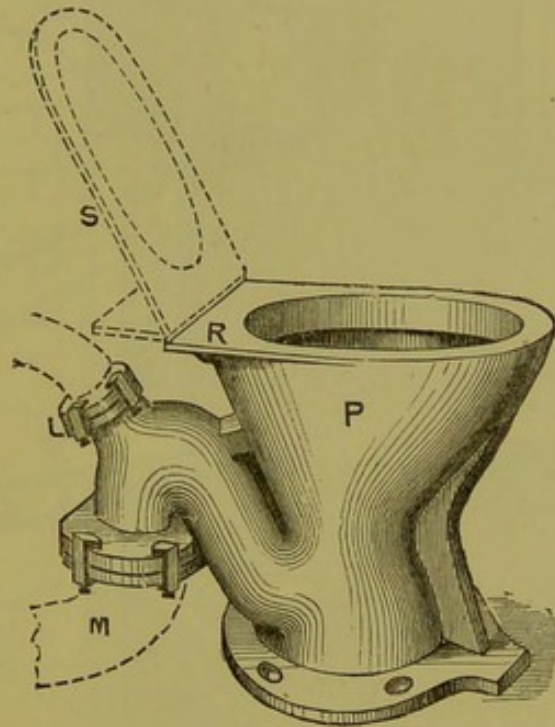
Pedestal "Hygienic" Closet, with Flanged Outgo, and Flanged Vent-Arm.
